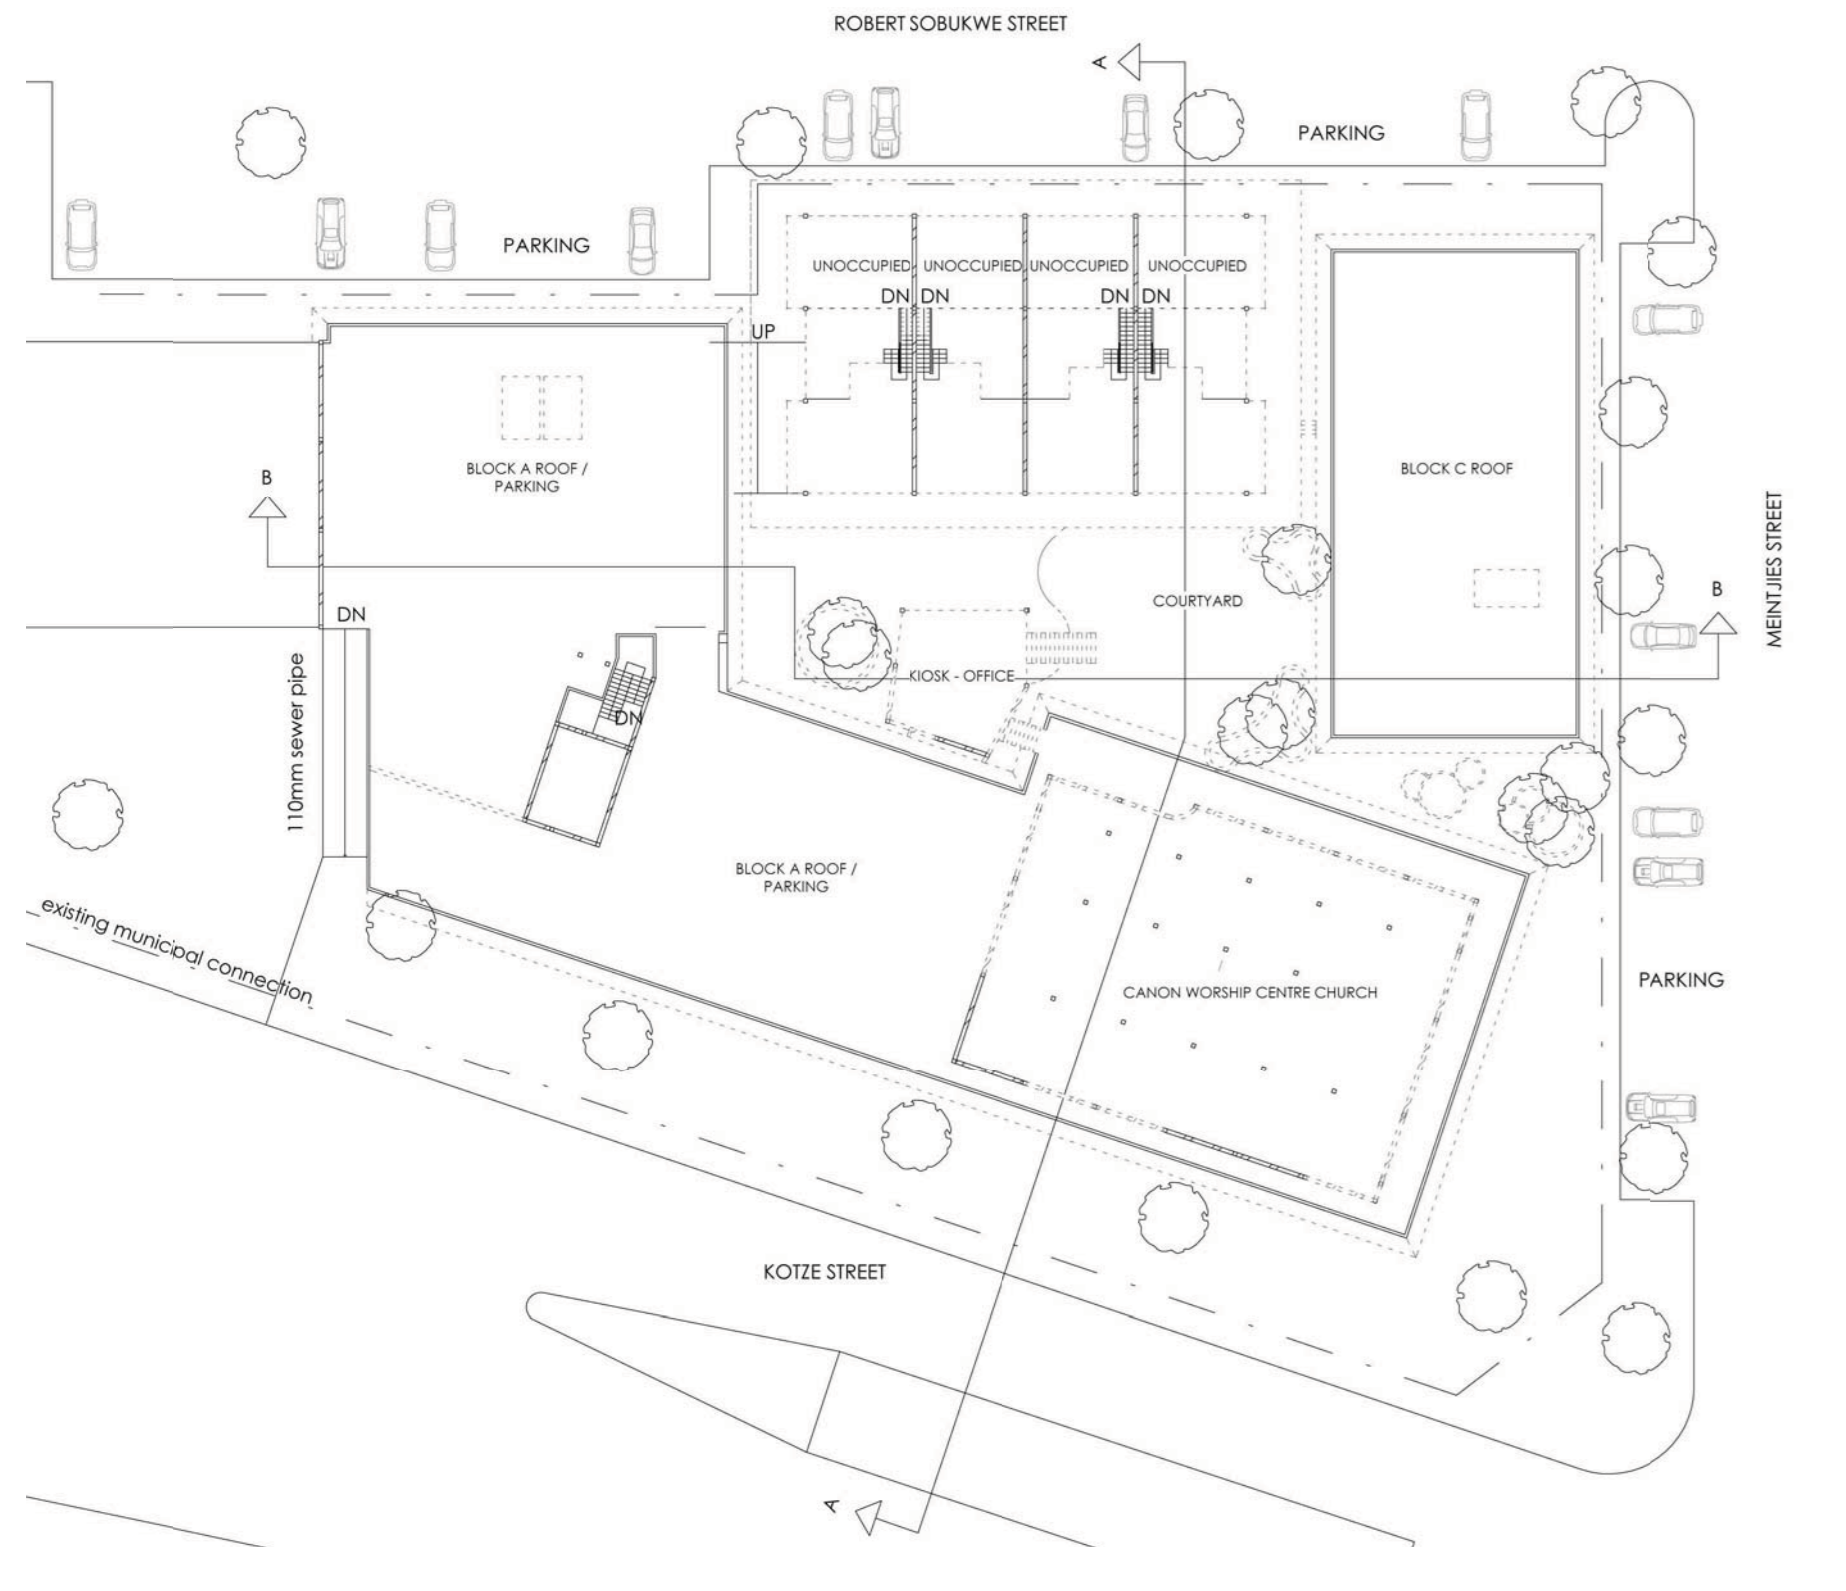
Demolitions First Floor Plan Scale 1:500
